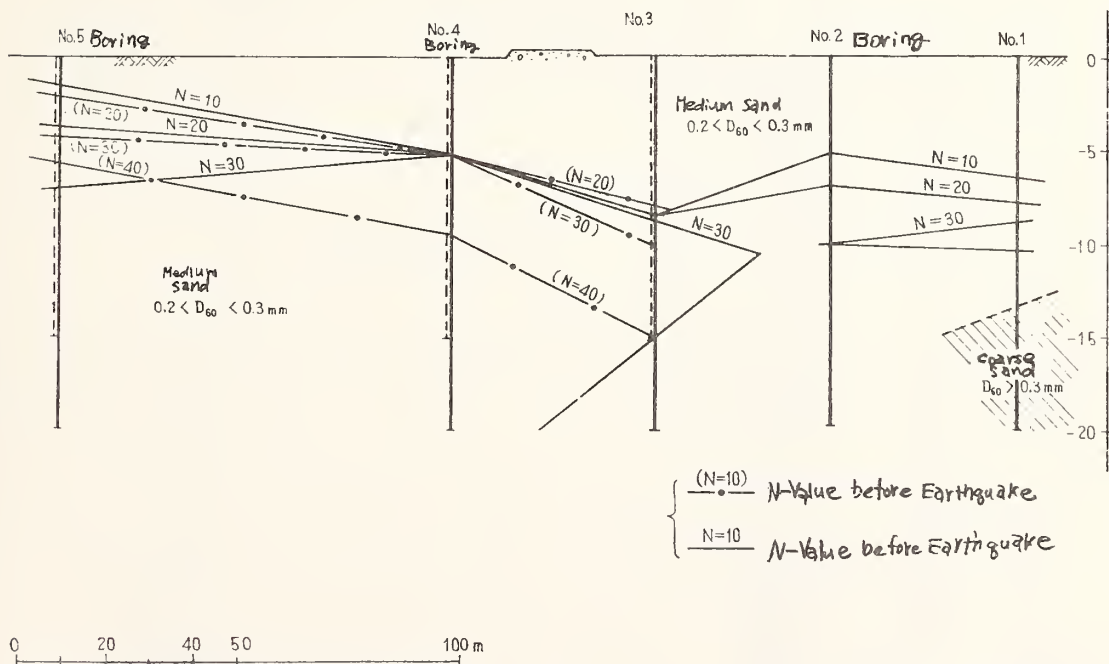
Soil profile at the Higashi-Kosenkyo bridge
